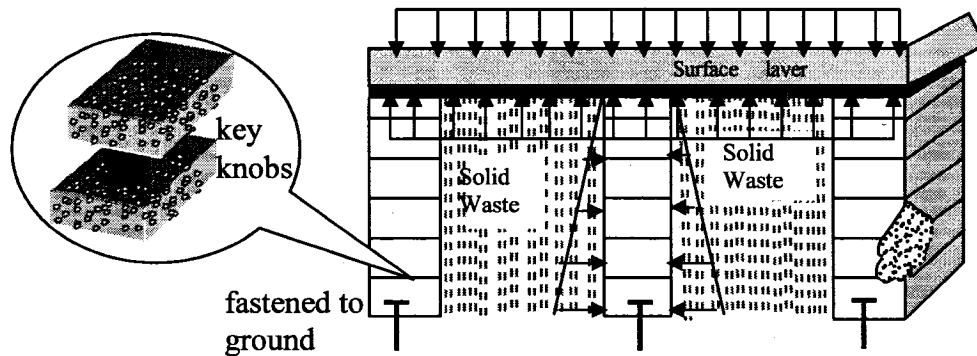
Waste Load Distribution on QMJ Bricks Structure
